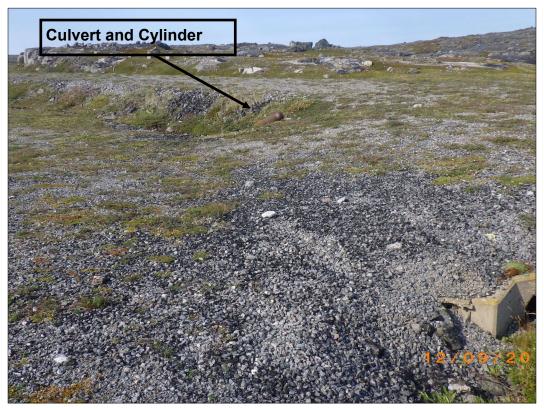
APEC #7: View potential concrete culvert and metal cylinder. (September, 2017)
